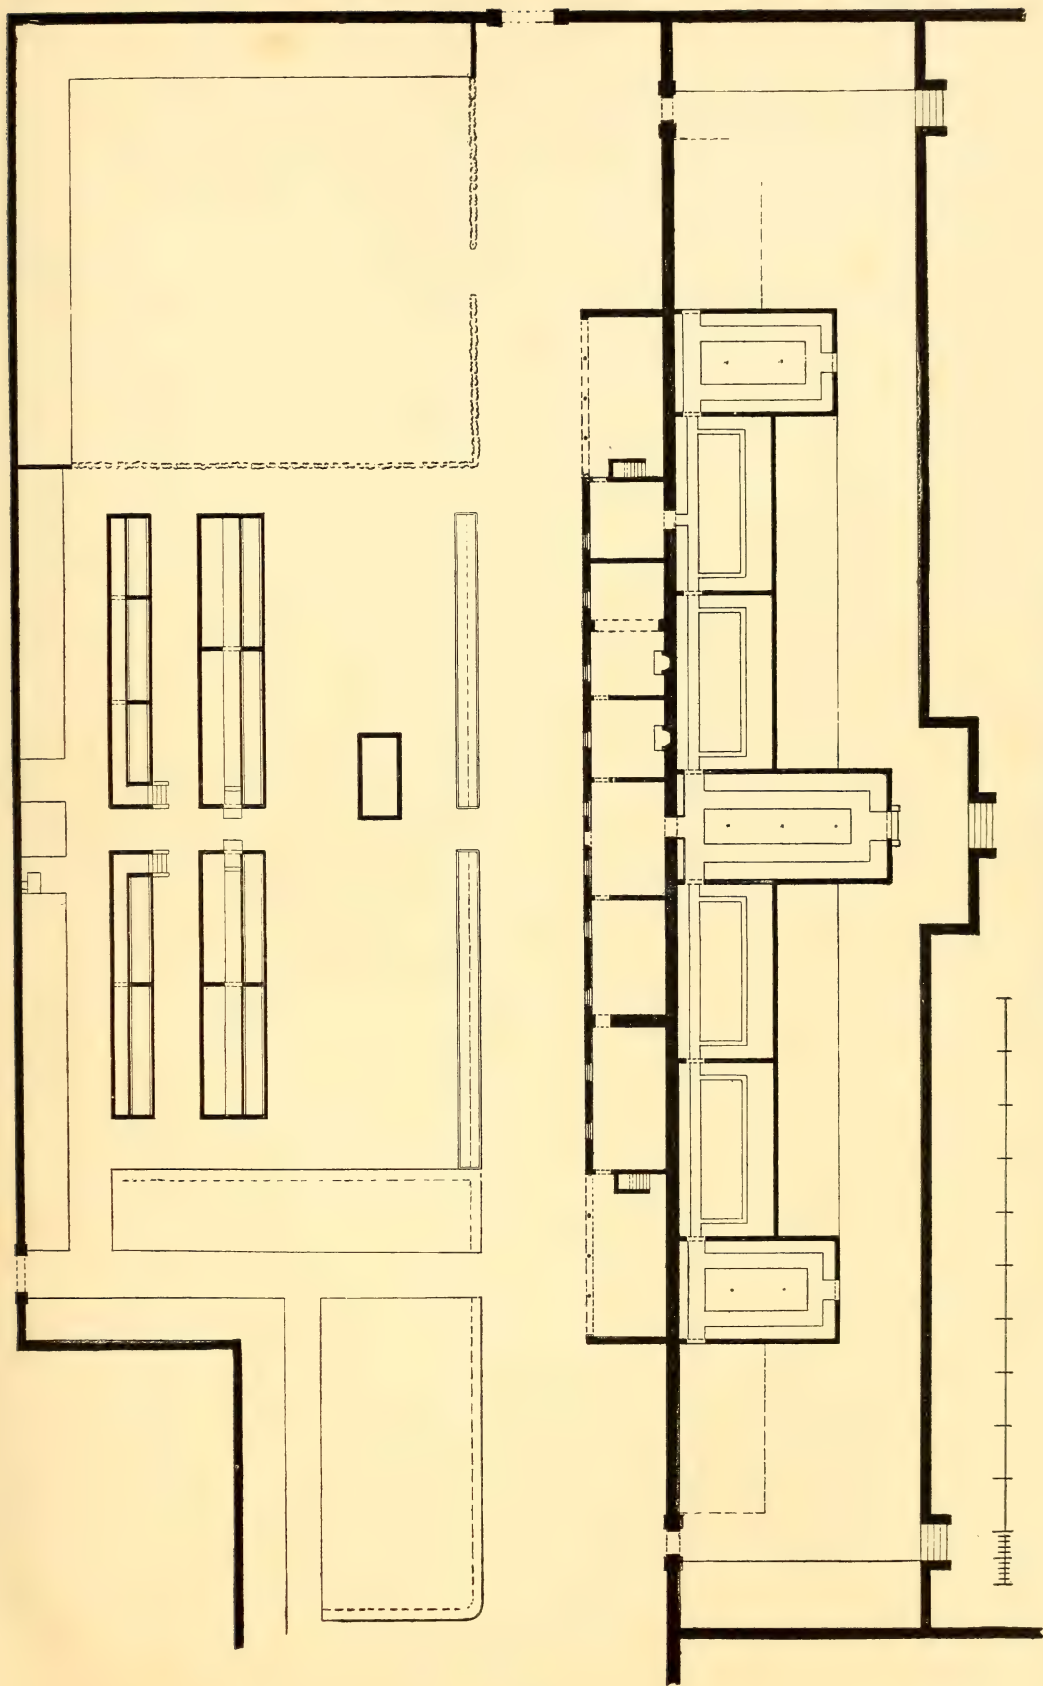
Ground Plan of Range of Plant-houses, Sheds, Frames, &c.
